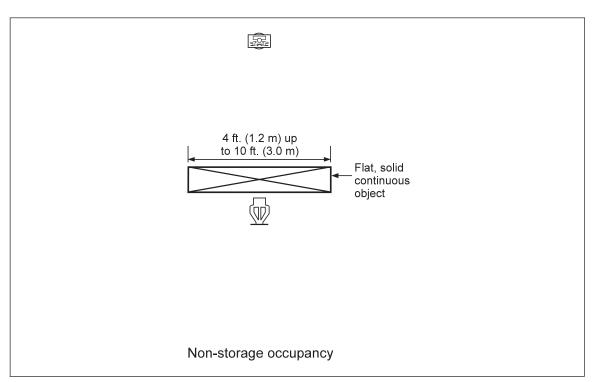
Additional sprinklers installed below flat, continuous, solid obstructions between 4 ft (1.2 m) and 10 ft (3.0 m) wide
